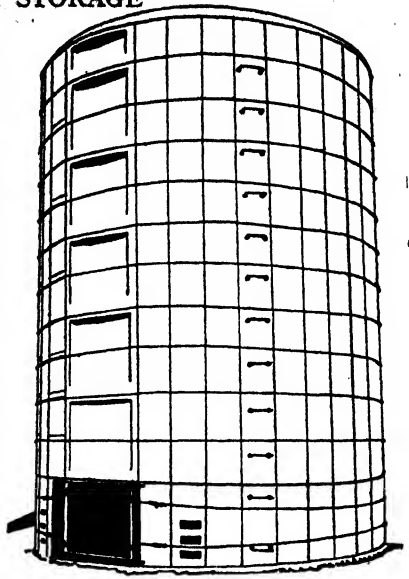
Circular bin constructed from pre-cast concrete staves. Note inverted louvres near bottom.
